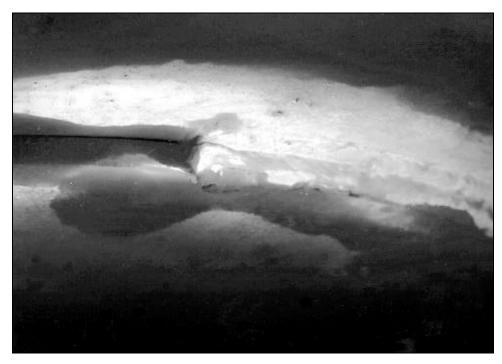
Liquid Penetrant Inspection Showing 0.050-inch Crack at Fillet Weld Termination of the Sill Bearing Plate
